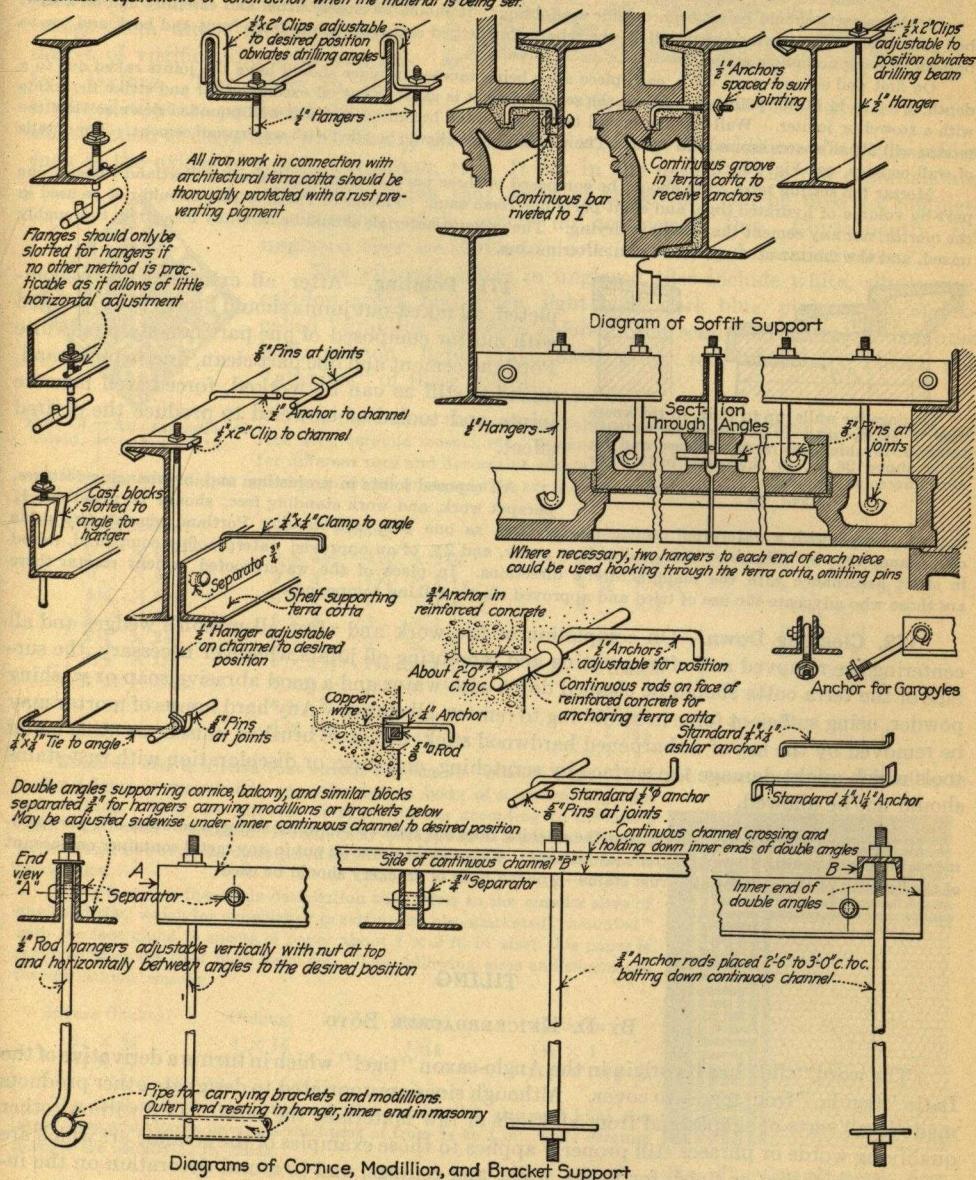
Details of iron anchors, hangers, straps, clips, etc. used, in setting architectural terra cotta.
